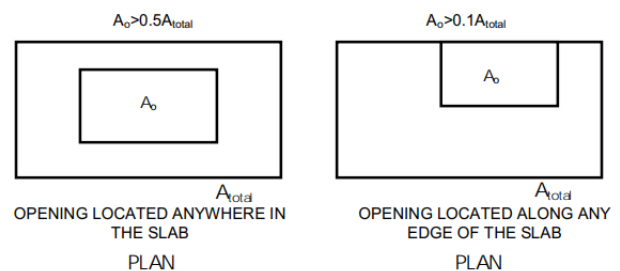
Floor Slabs having Excessive Cut-Outs or Openings
